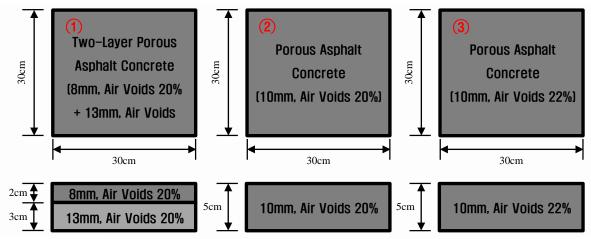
Wheel tracking specimen planning by alternative low-noise pavement
